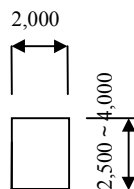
Preliminary Plan of Ticket Windows
